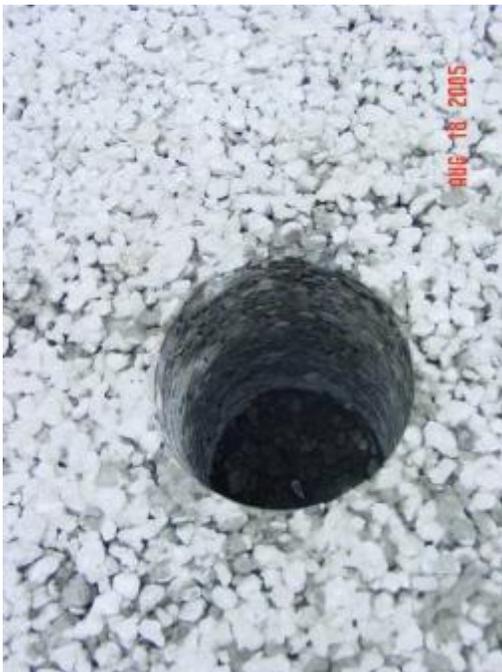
Permeable concrete core hole on curb-to-curb section. (City of Portland)
